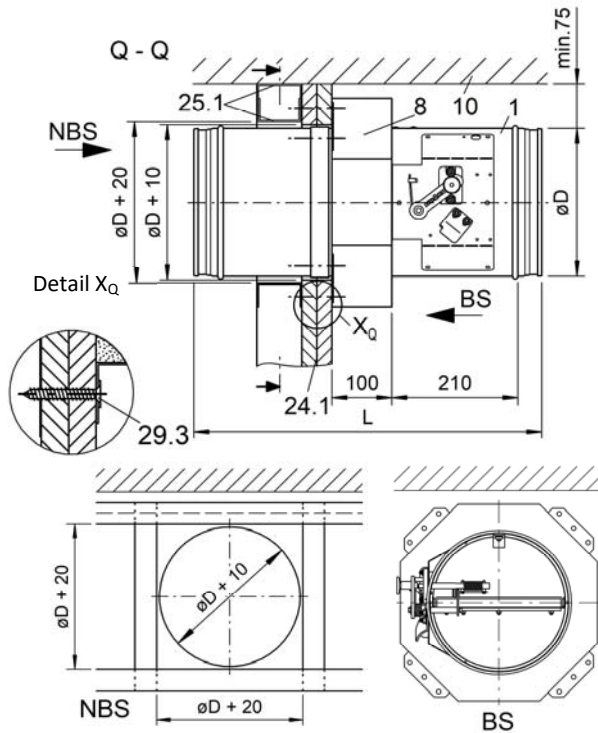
Dry installation on shaft wall with mounting frame AR under solid ceiling
